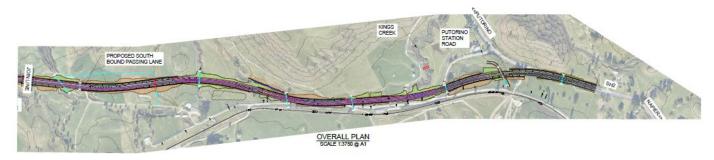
Extract from the General Arrangement Plans showing the southern section of the proposed realignment
